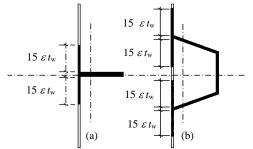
Effective cross-section (a) open section stiffener (OSS), and (b) closed section stiffener (CSS).
